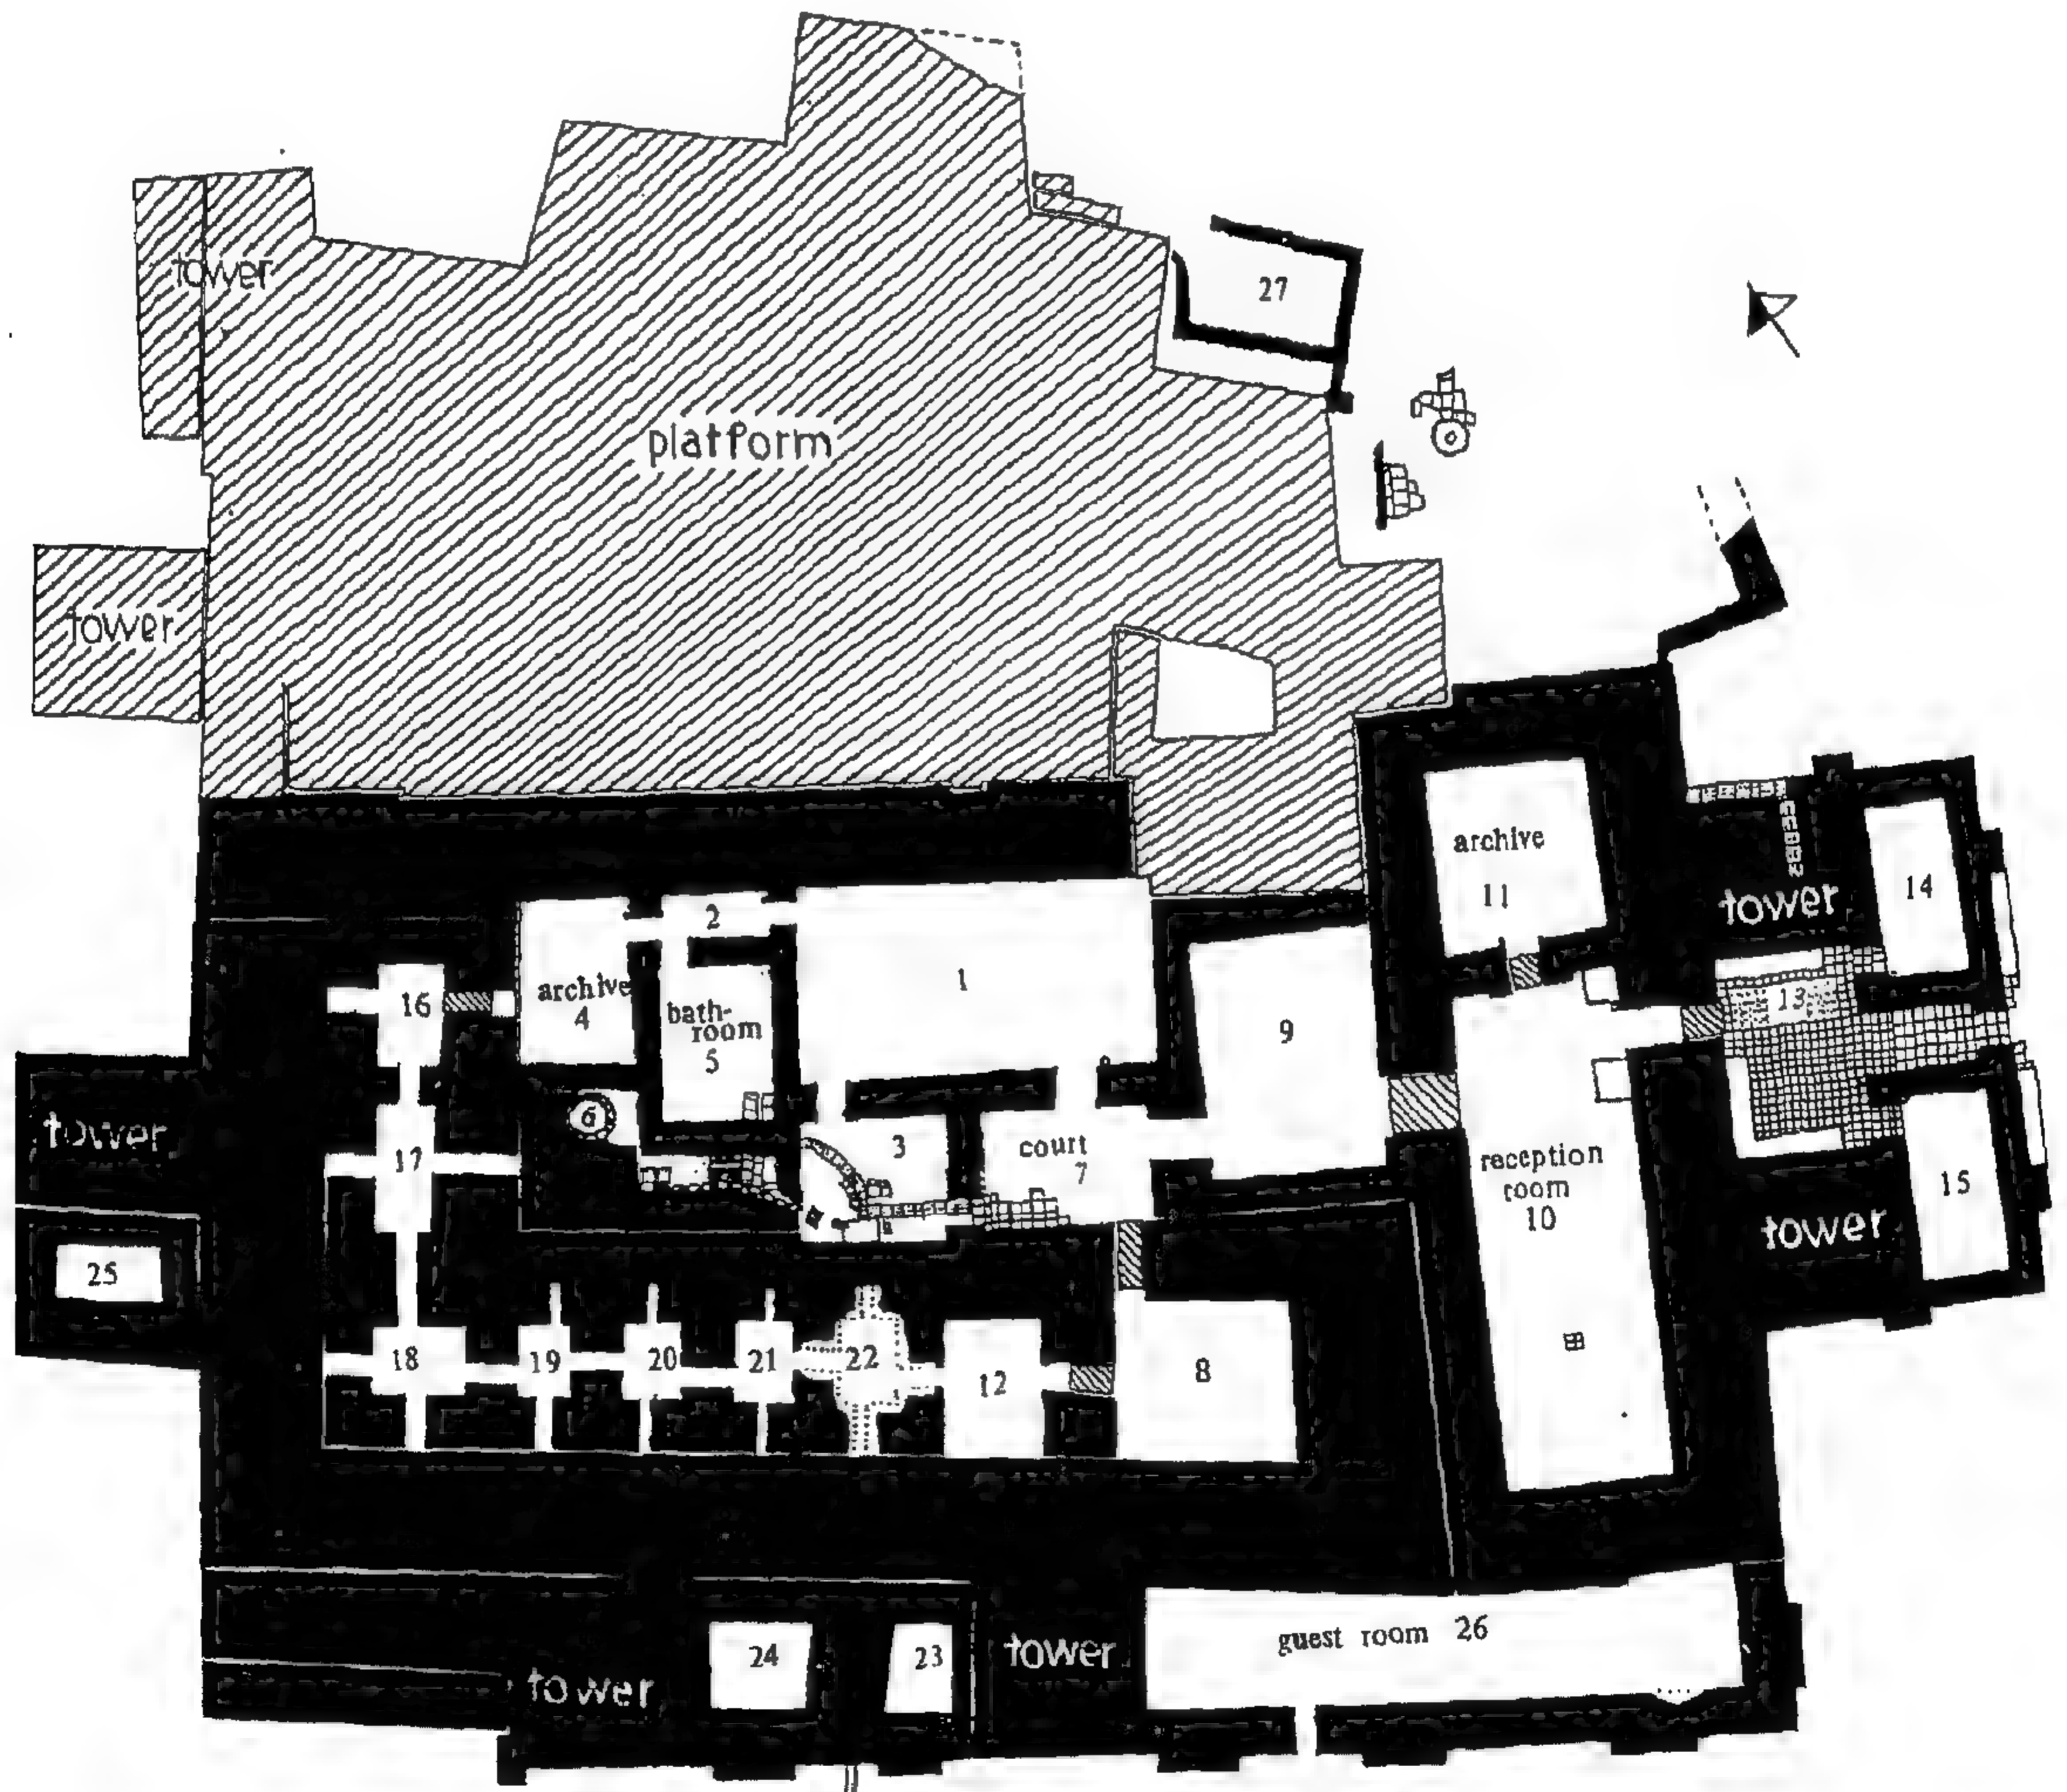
Tell al-Fakhar, site plan showing the excavated area, 1967
